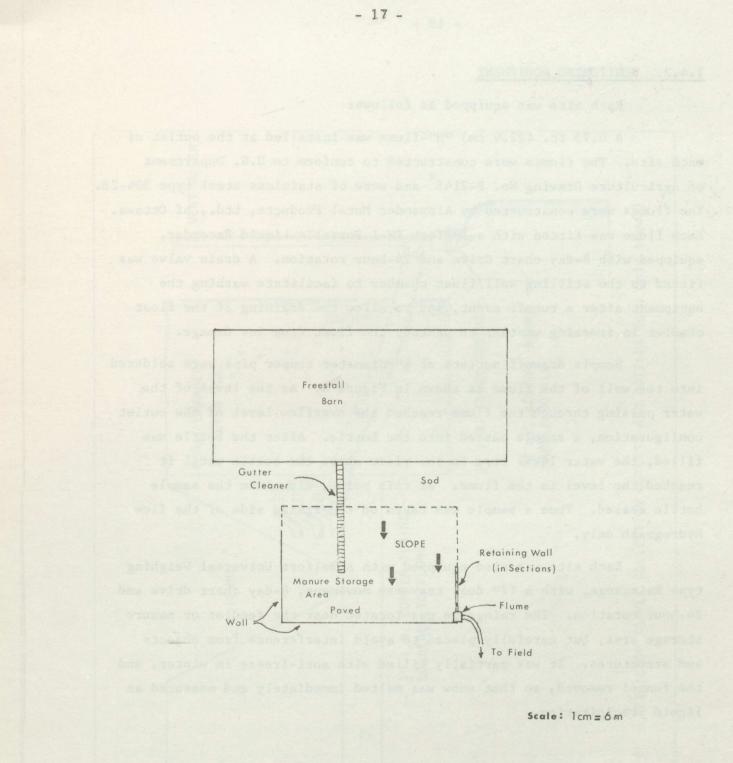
Sketch Plan of Manure Storage, Site # 4
